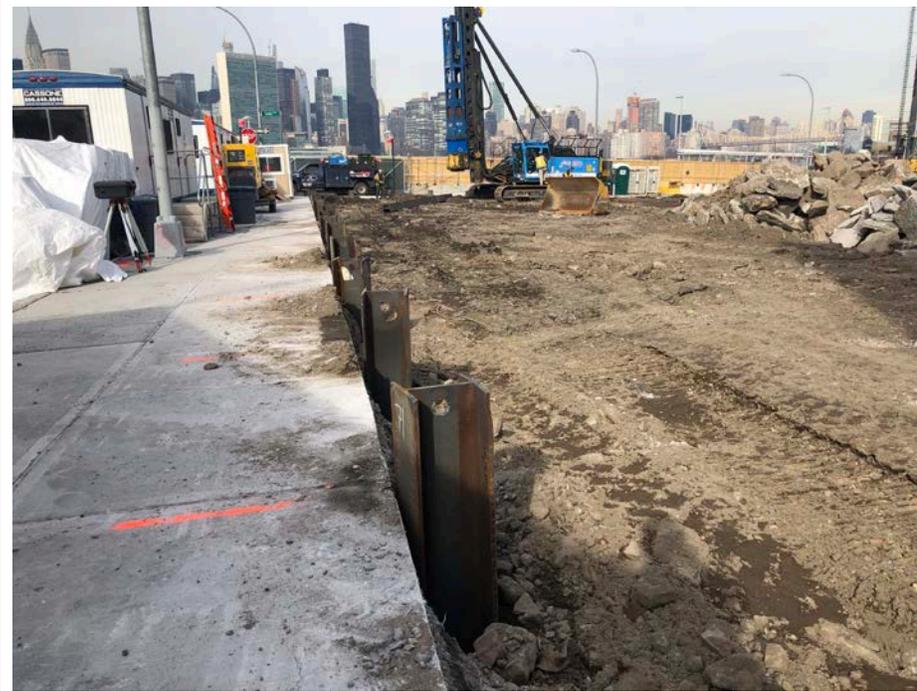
Looking northwest, site status of northwest portion of site including SOE piles.
